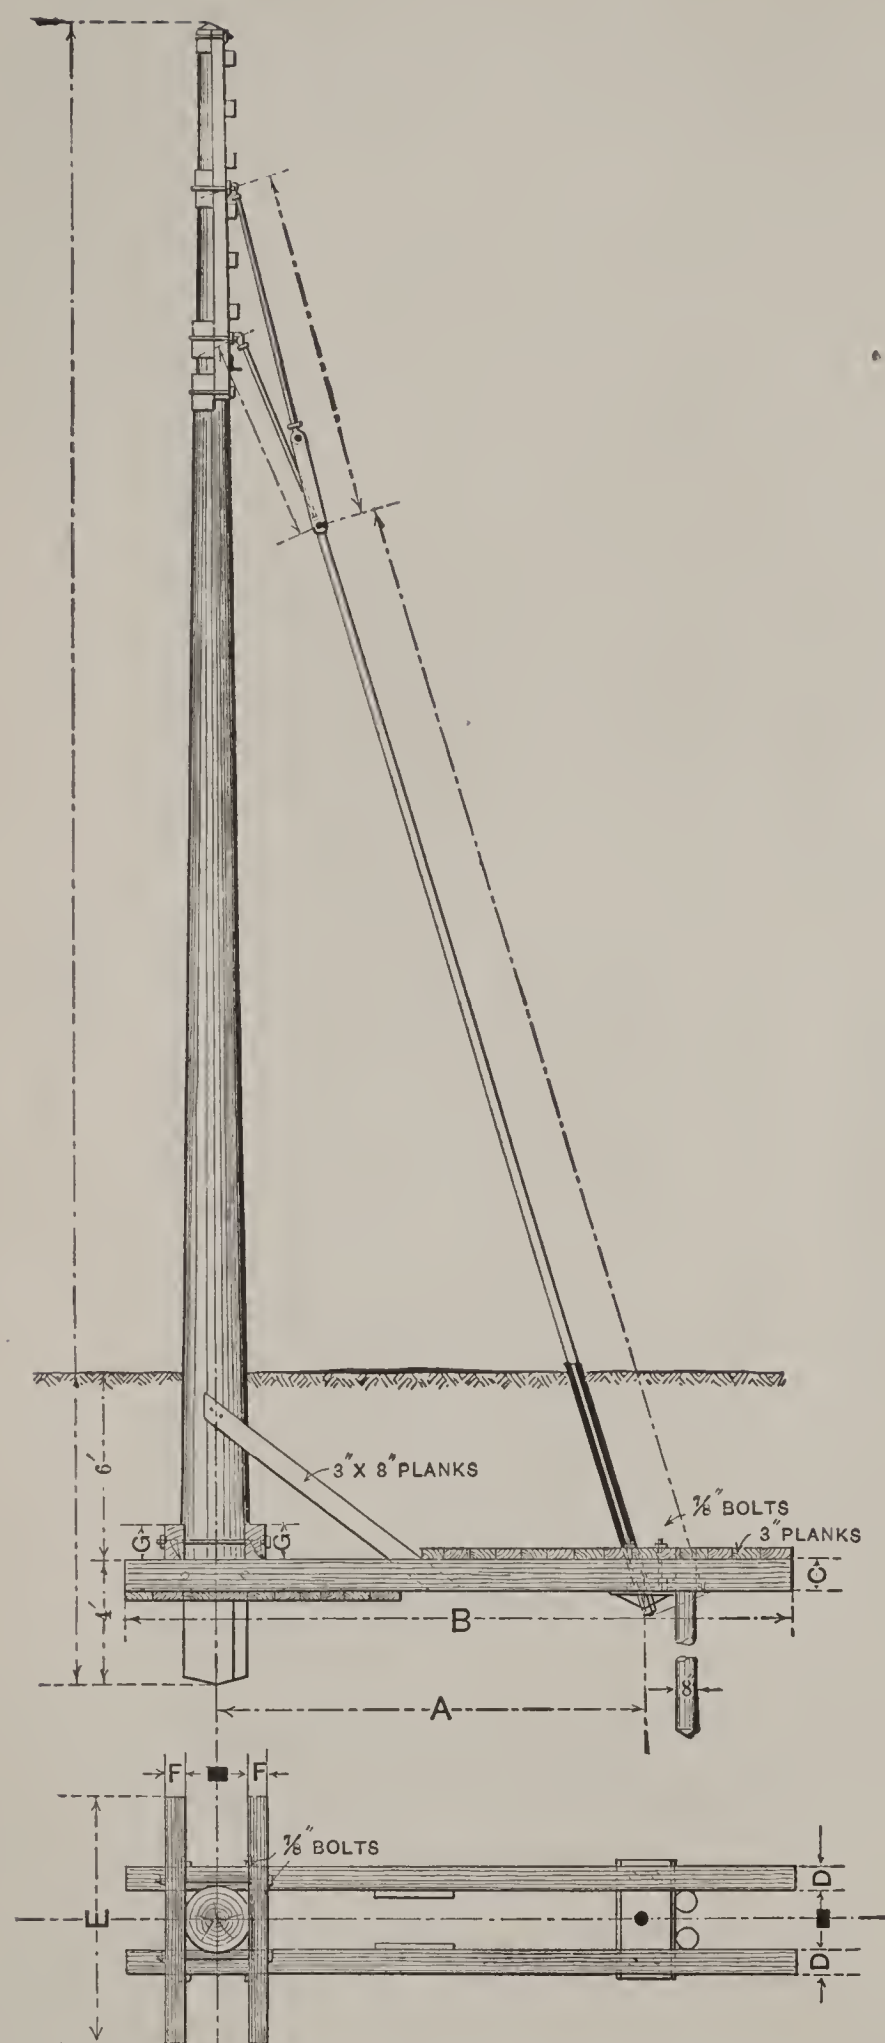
Plan and Elevation of Combination Anchor Pole.
